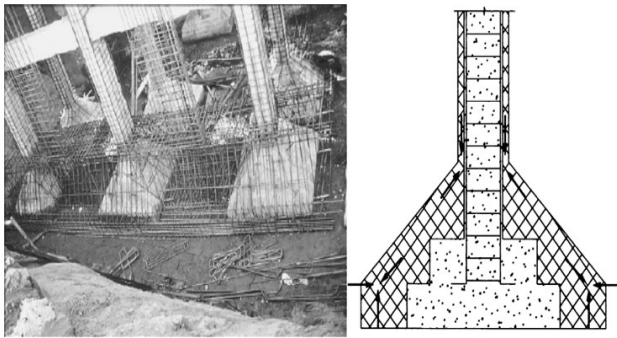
Strengthening of existing footings - RC jacketing [54]. (Reused after obtaining permission).
